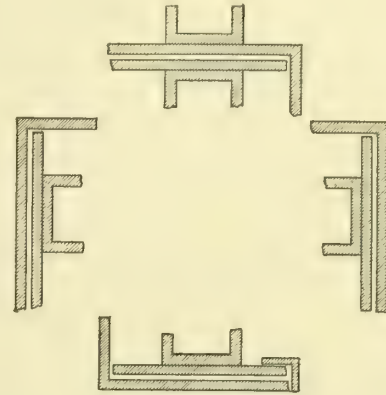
SECTION OF DOUBLE DOUBLE BOTTOM VENTILATOR
